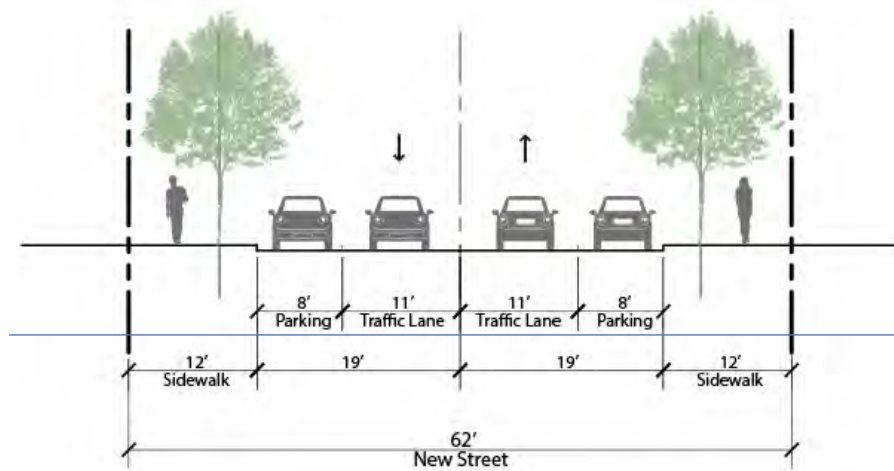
Commercial Core New Streets without Center Turn Lane Typical Cross-Section.
